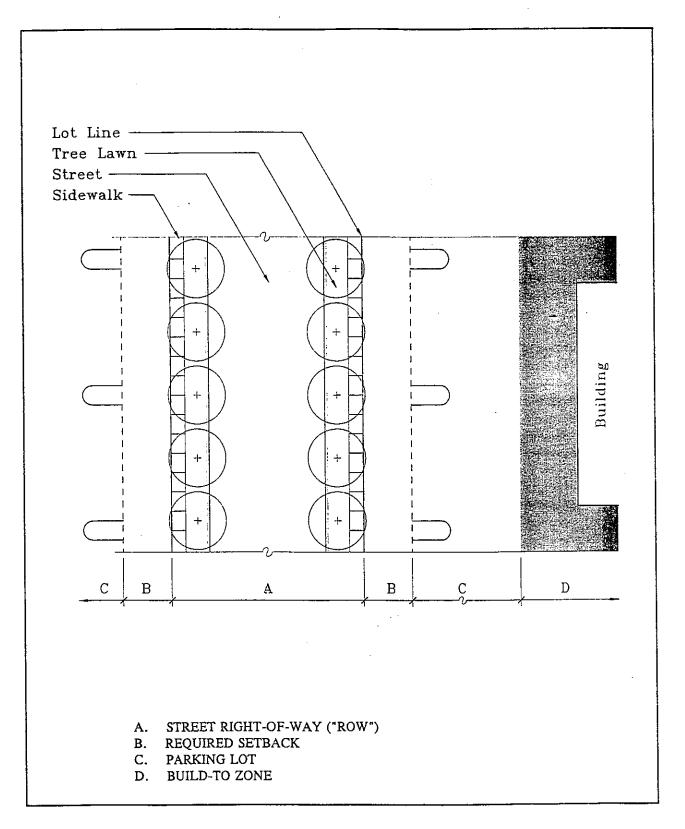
Illustration No. 2 Build-to-Zone, Setback, and Street Right-of-Way
